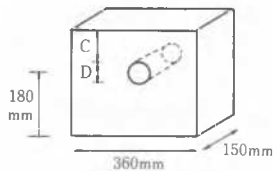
Dimensions of 3D test series (plane-section tunnels)
